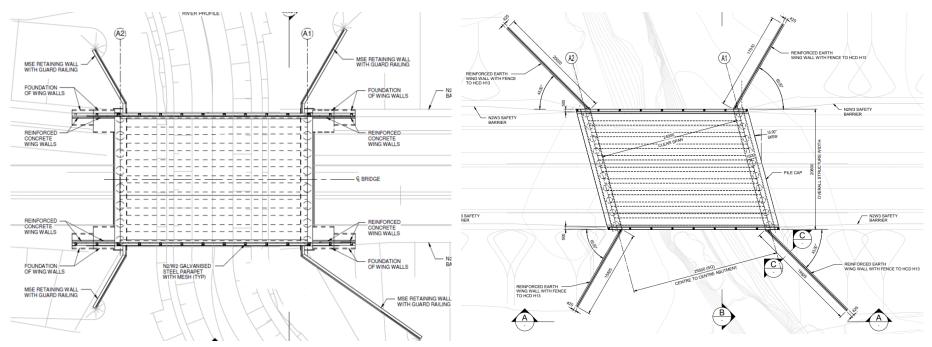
Plan of proposed square River Chelt bridge with straighter Figure 2-7 Plan of the skewed River Chelt bridge design in Scheme design River Chelt
